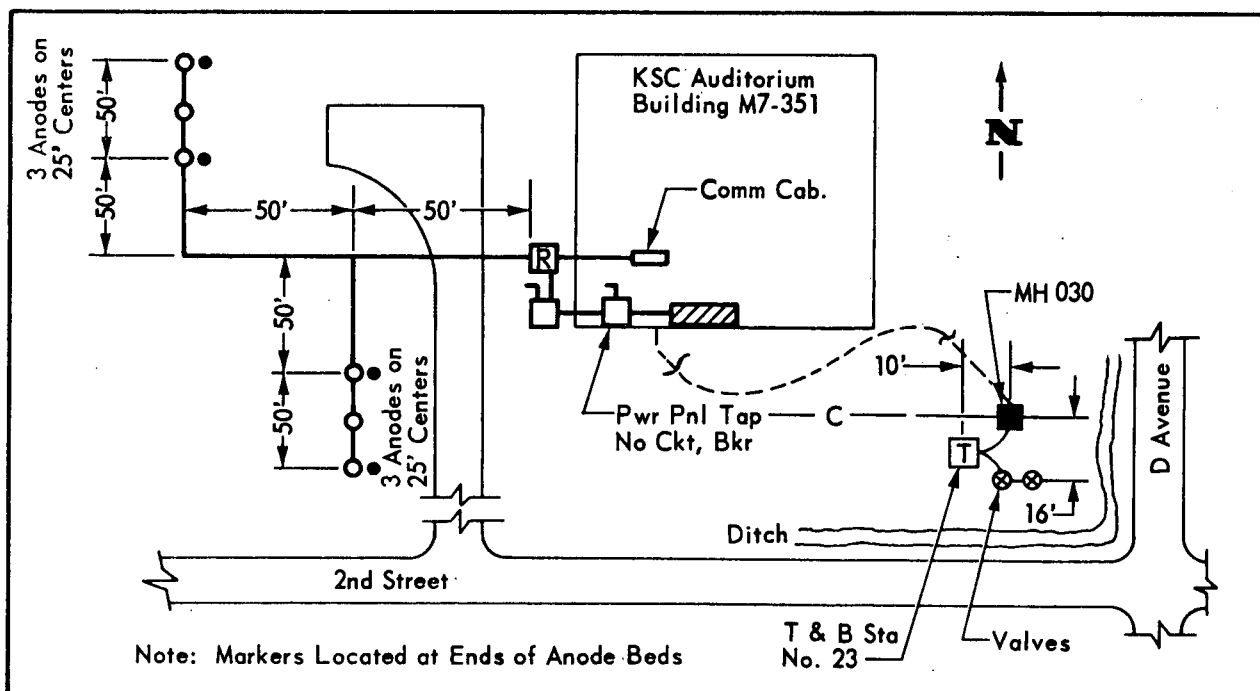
Site No. 28 and Test and Bond Station No. 23 Equipment Locator
